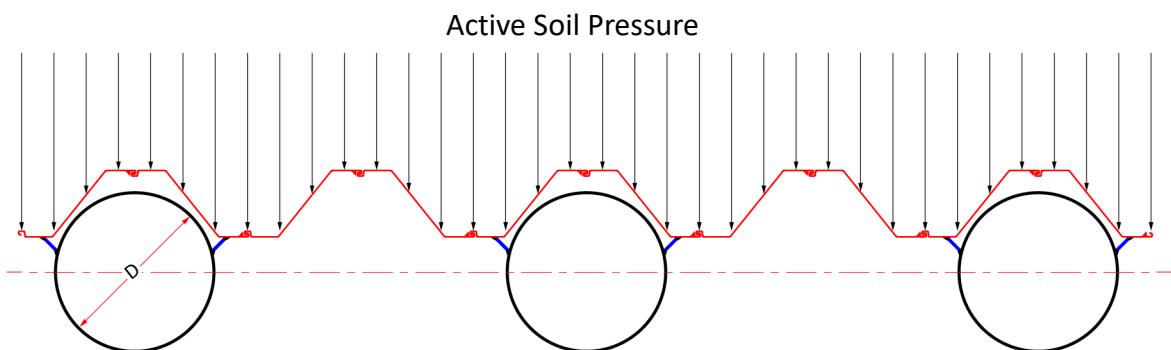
(b). Earth pressure diagram - Plan in section A-A (Pattern A, above formation level)
